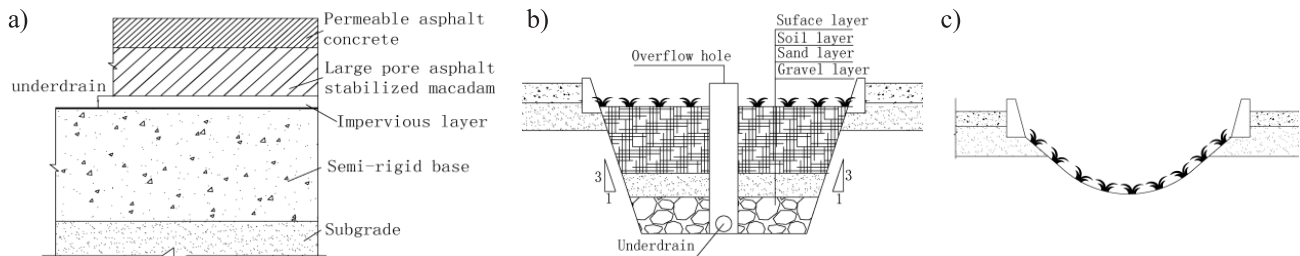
LID facilities: a) Permeable asphalt pavement, b) Bioretention, c) Grass swales.
